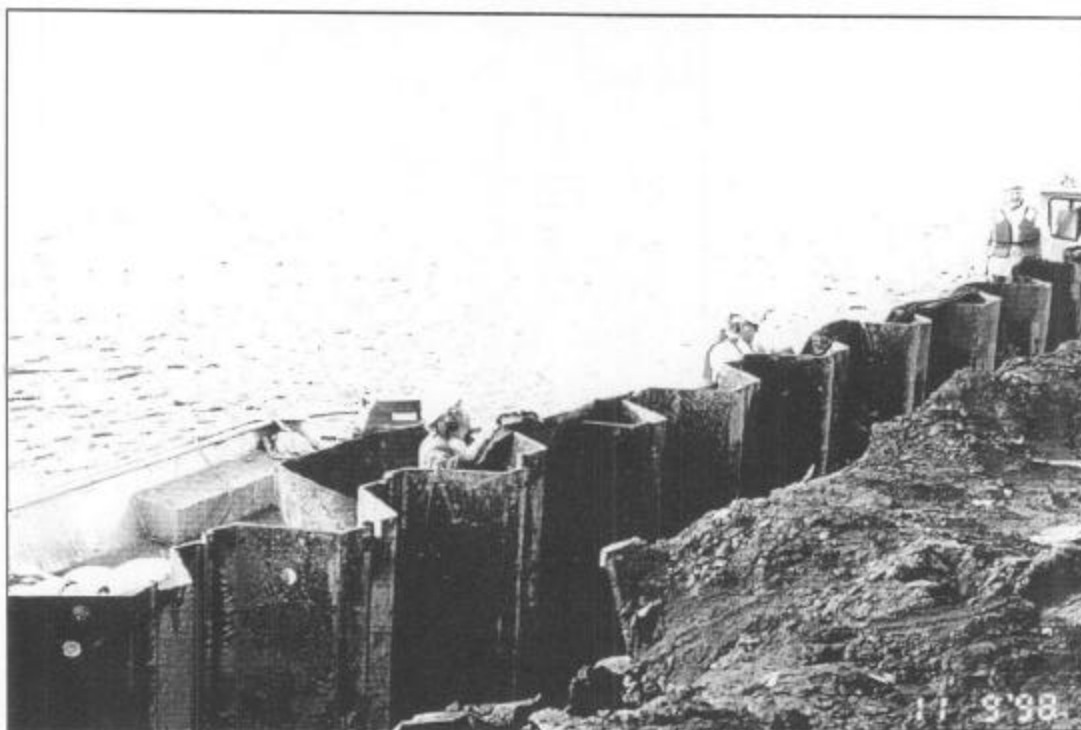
Clamping Geotextile Fabric End to Sheet Pile Wall
